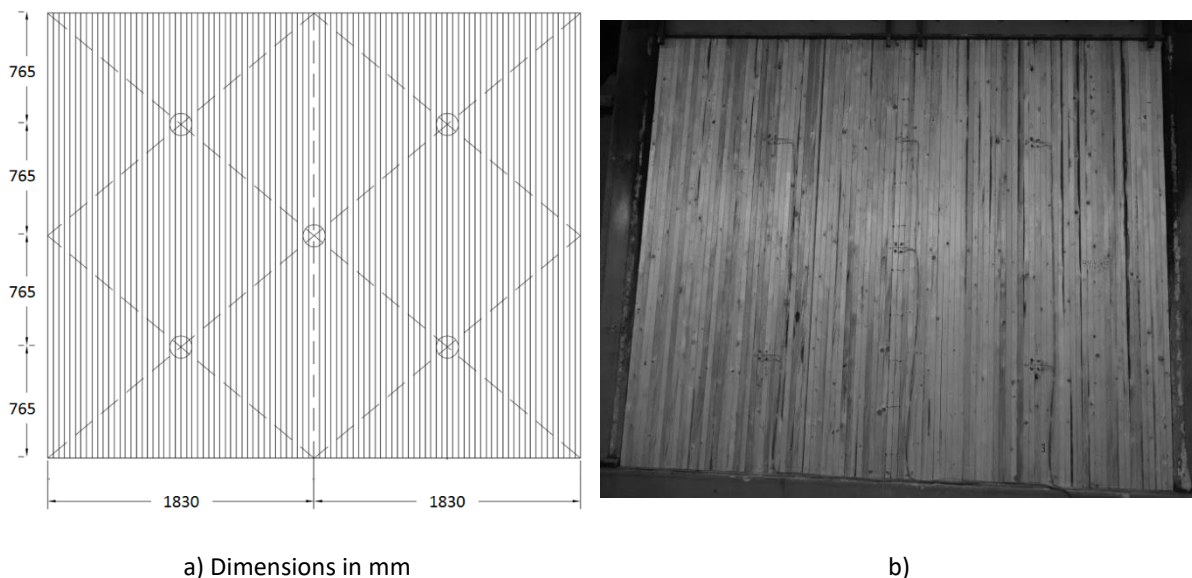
a) NLT wall construction detail; b) NLT wall surface
